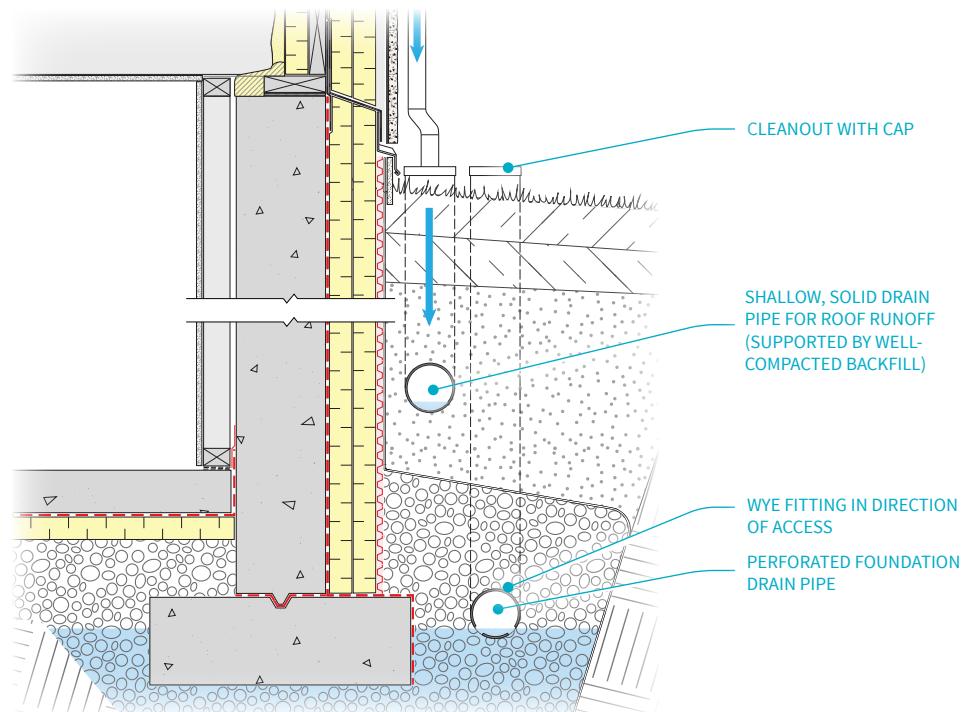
Schematic of a "best practice" dual pipe drainage system: rainwater leader downspouts are directed to shallow, solid pipes separate from the foundation drainage system.
